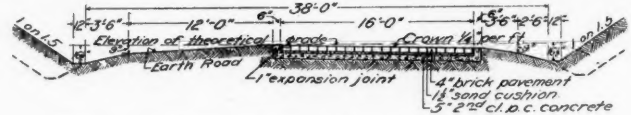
BRICK WITH EARTH ROAD AT SIDE.
